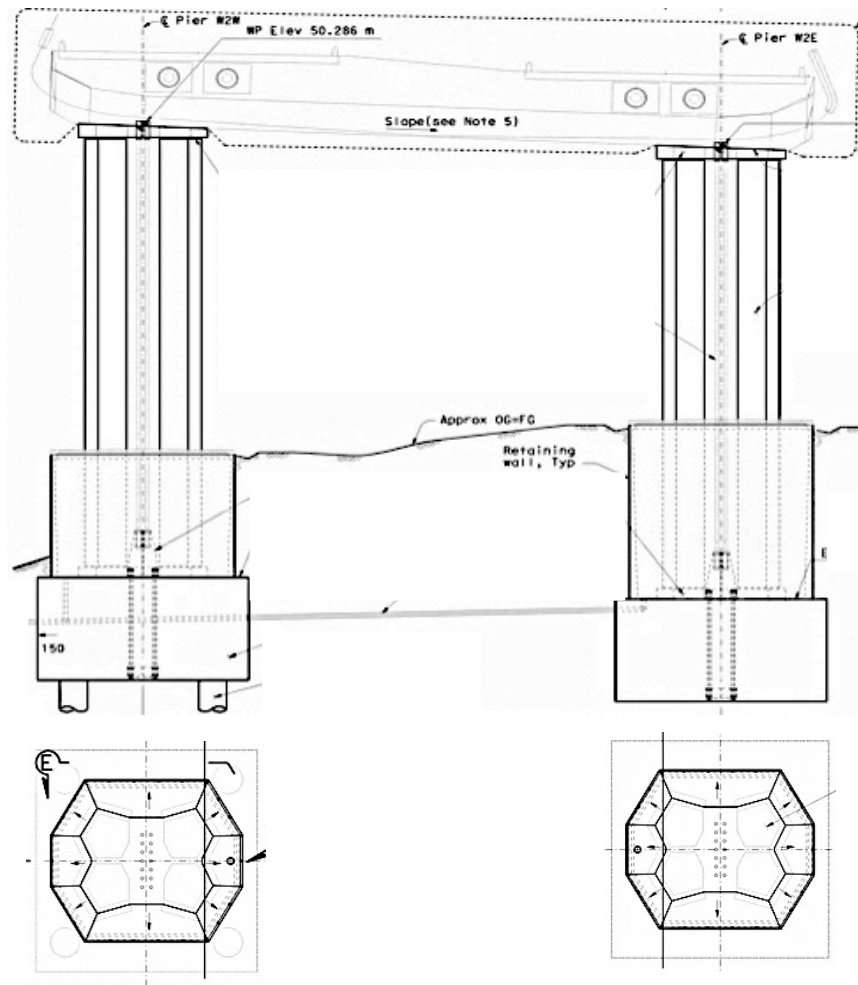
West transverse elevation with foundations, pier, cap beam and typical cross section (Ref.: Caltrans)
